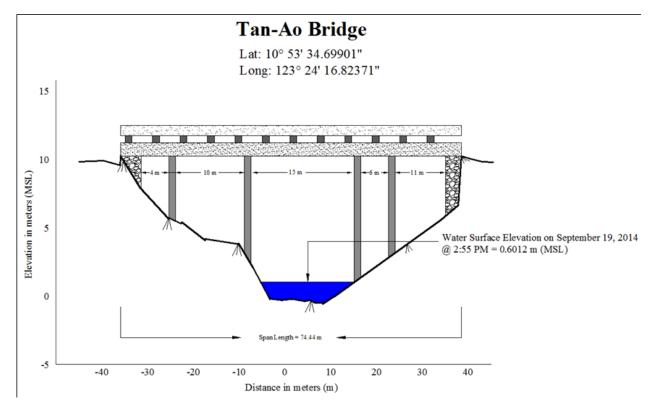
The Tanao Bridge cross-section survey drawn to scale
